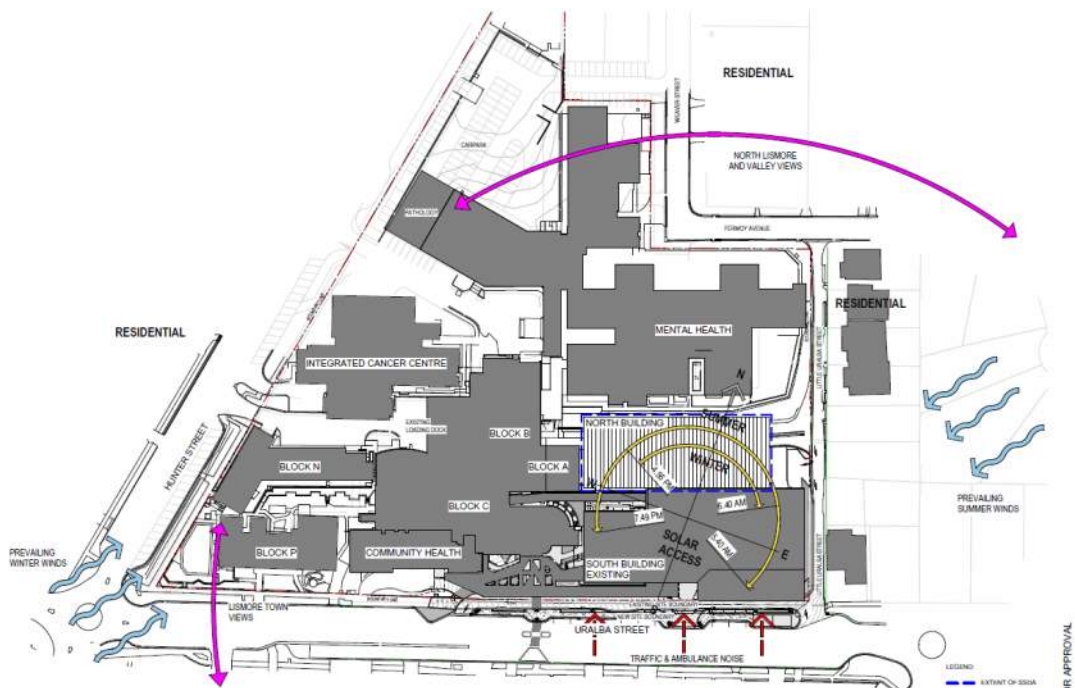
Site Analysis Plan Extract (Source: CGA, Sheet DA10000)
